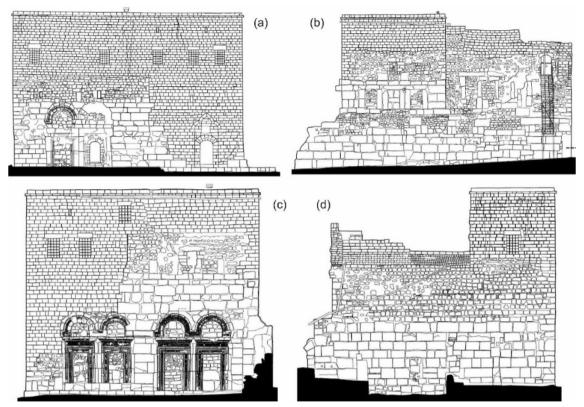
Facades measured drawings of Mor Yakup Church a west façade measured drawings of building, b east façade measured drawings of building, c south façade measured drawings of building, d north facade measured drawings of building
